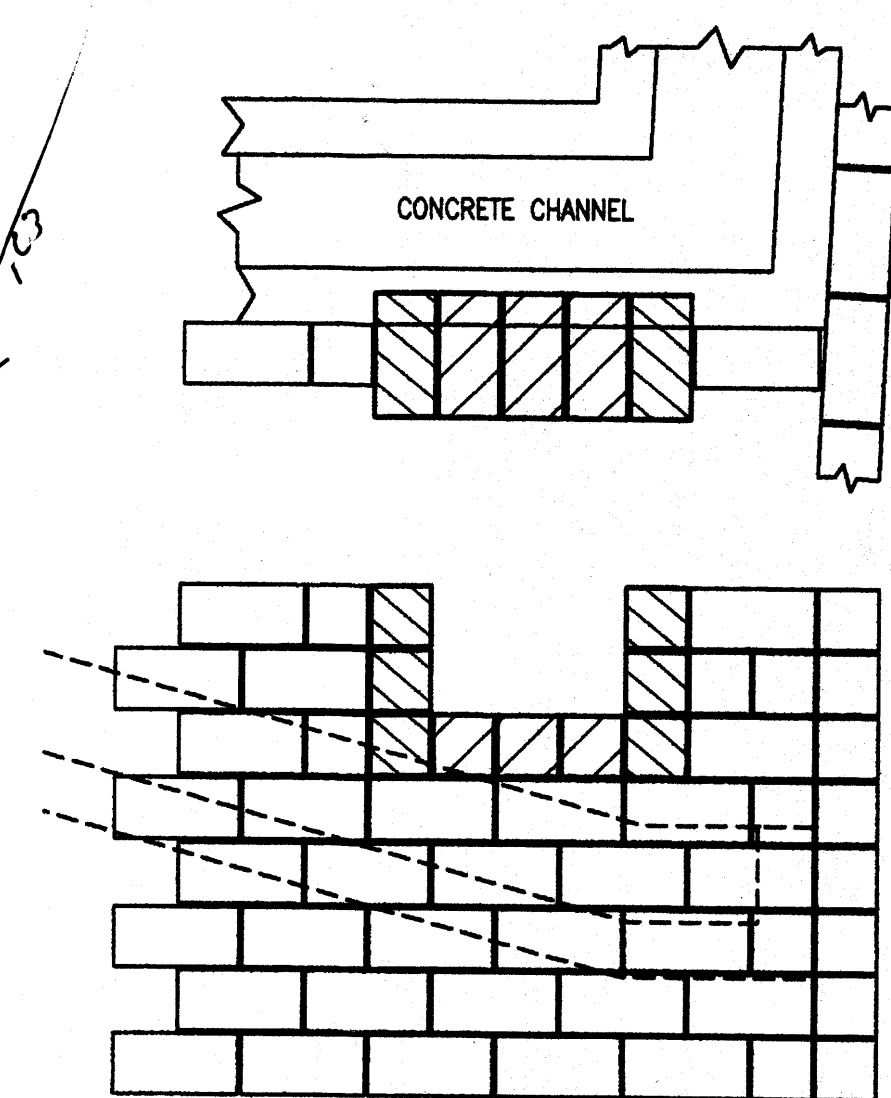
": CHANNEL JUNCTION & OUTLET DETAILS, NE CORNER LOT 8A
